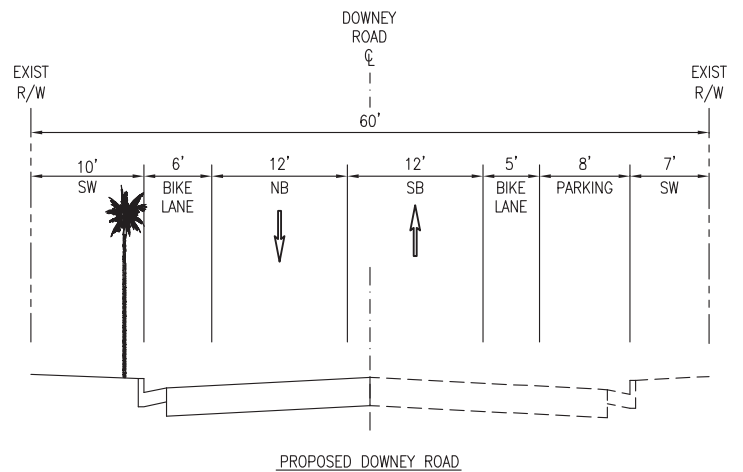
D - STREET SECTIONS - DOWNEY ROAD
